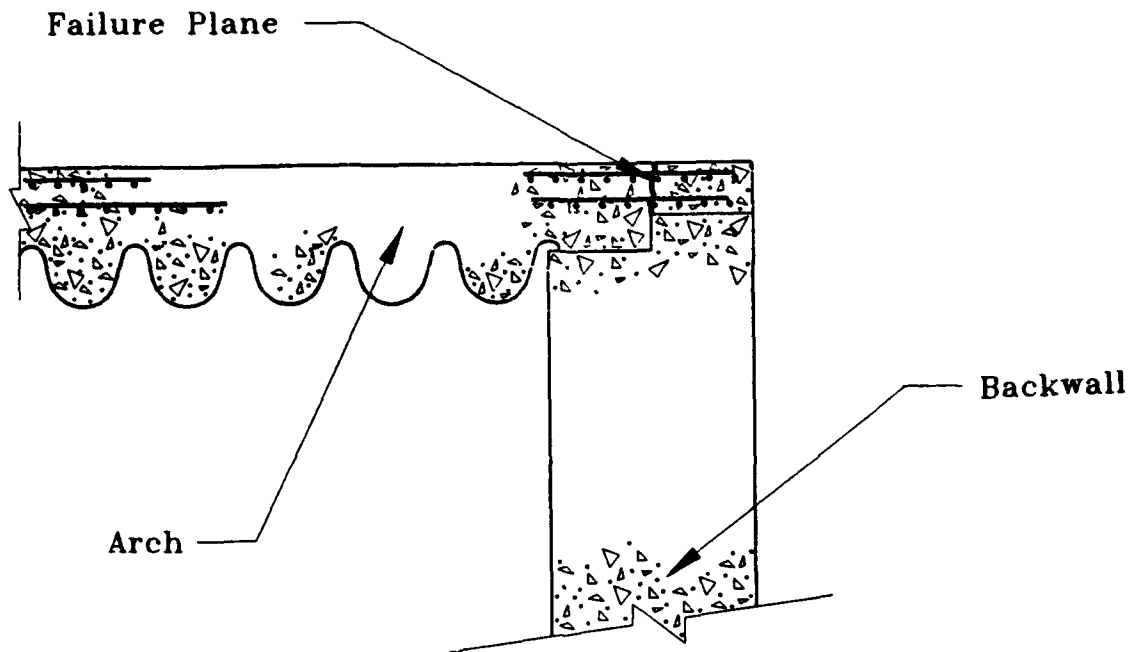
Section: Failure plane between the arch and backwall, PAS-2.
